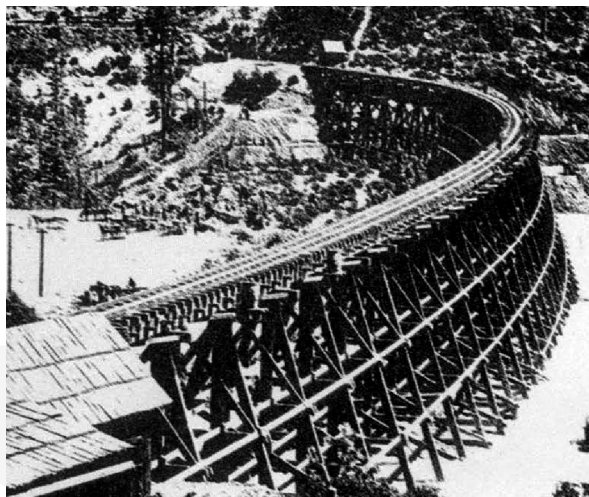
The structure of the wooden Secret Town Bridge – source: The New York Public Library Digital Collection (source: <http://digitalcollections.nypl.org/items/510d47e0-b62c-a3d9-e040-e00a18064a99>, access: April, 2016)
